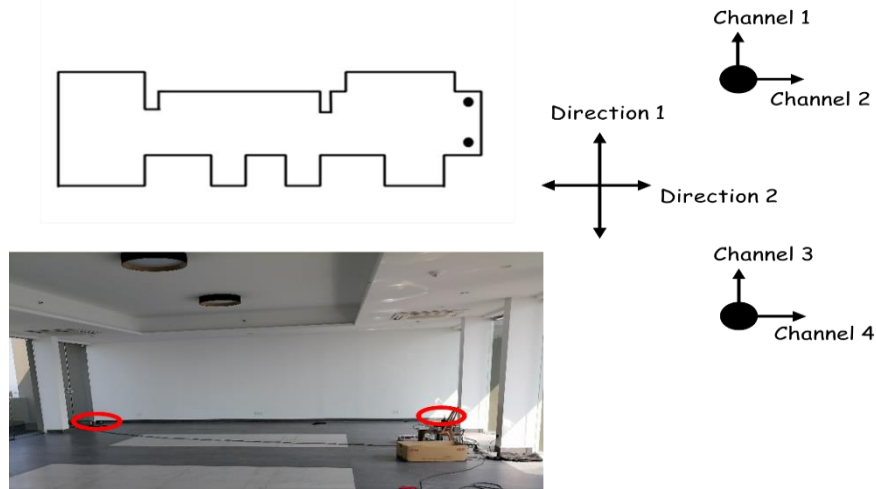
Arrangement of two accelerometers on the top floor of Luna Tower.
